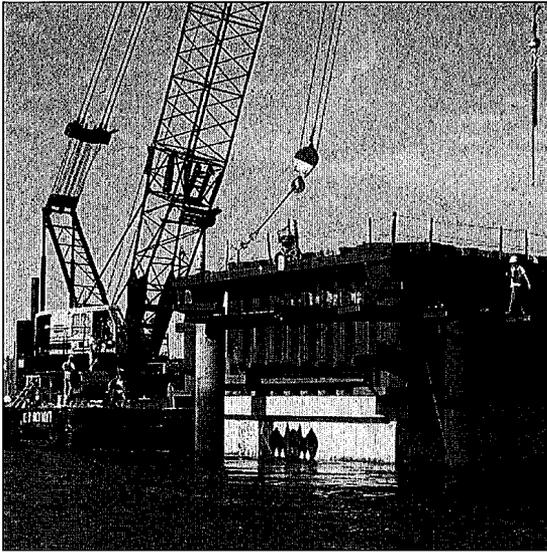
Precast concrete “lost” cofferdam with removable steel frame.
